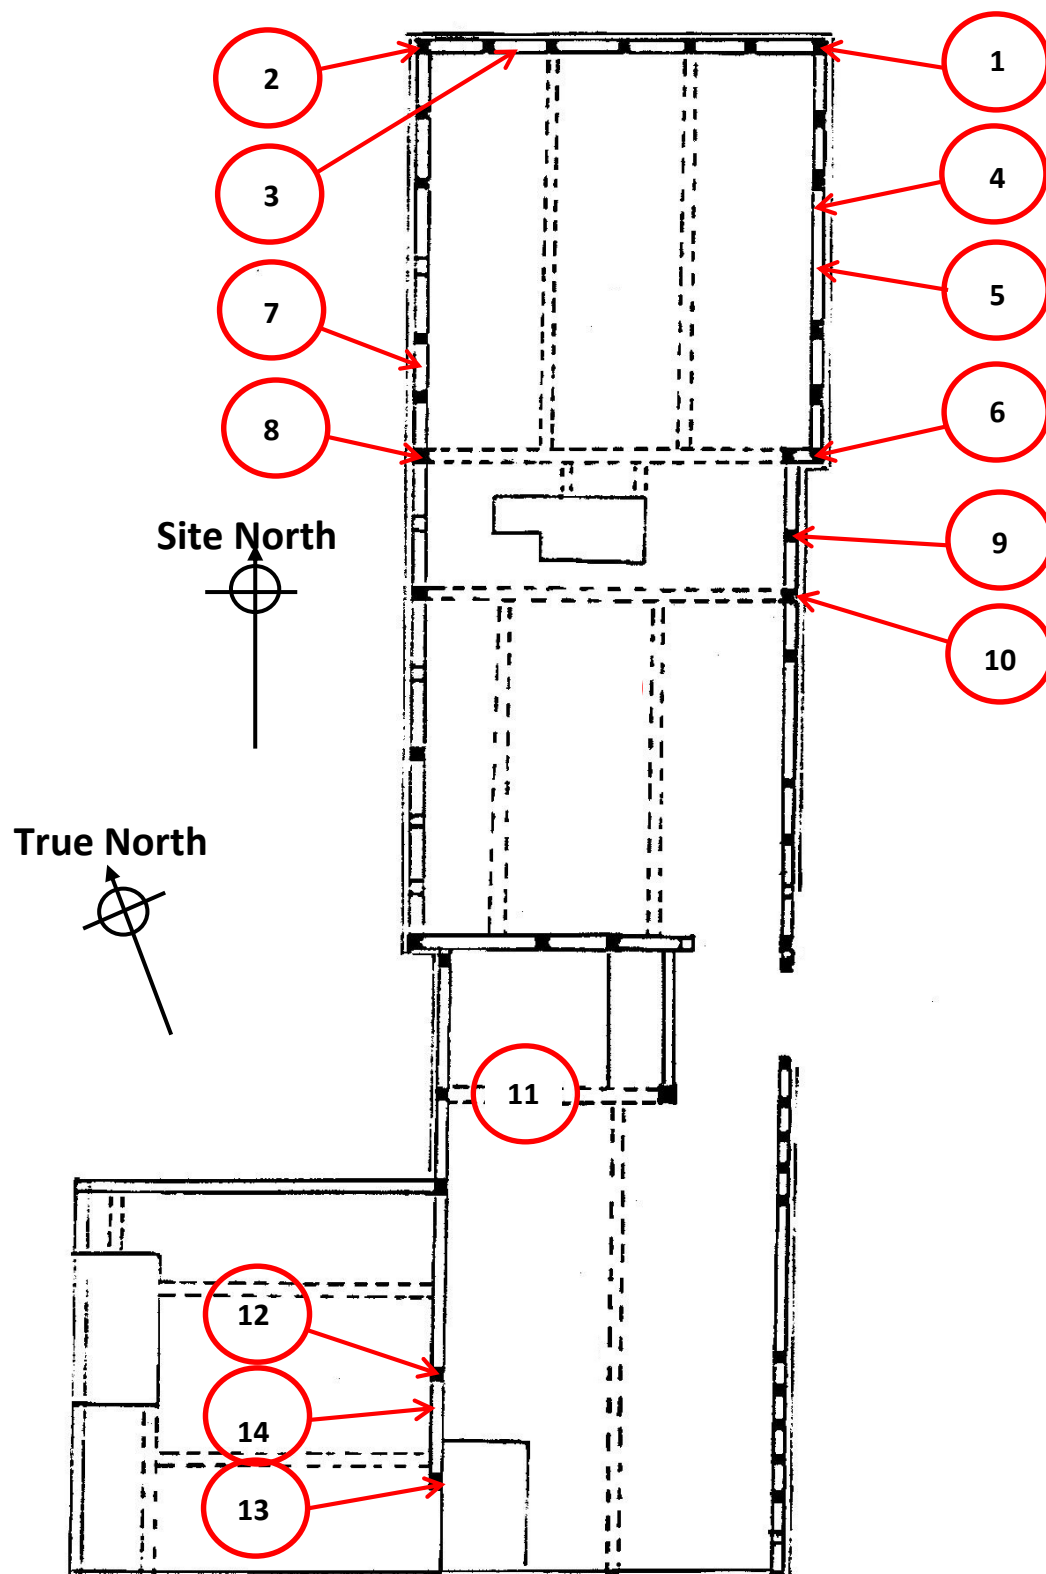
Plan (based on ground-floor survey drawing) to show the approximate positions of the sampled first-floor timbers (see Table 1) (after W J Smith)
